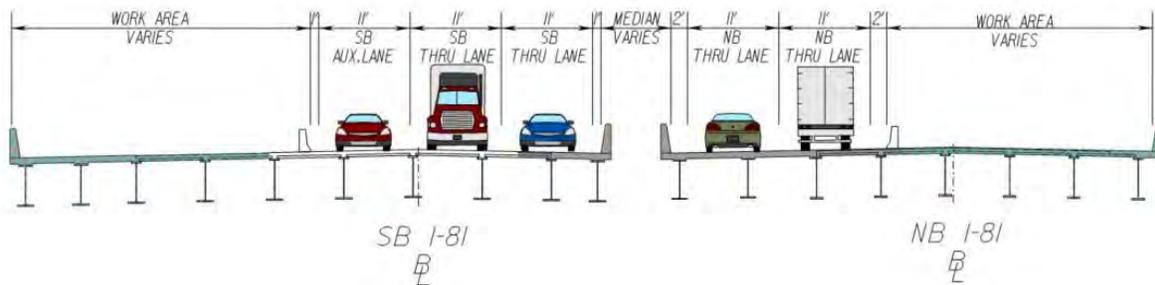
Stage 2 Construction Bridge Rehabilitation RT 311 Step 1
